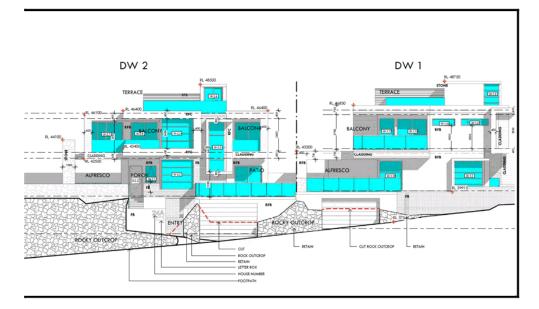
Proposed Development - Holland Avenue Elevation (Source: Space 0.618:1, dated November2018)
